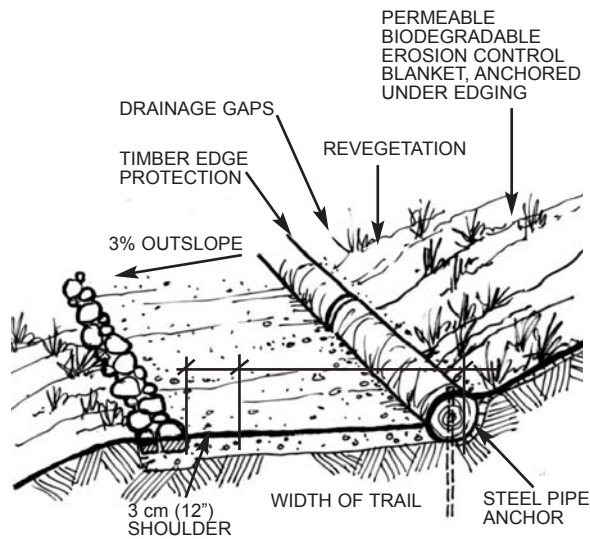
Edge Protection: Trail Setting (BMP 5-1)
